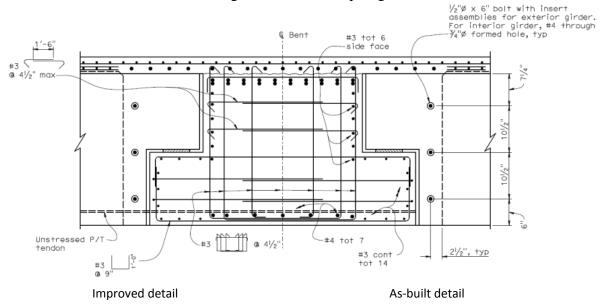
Girder-to-cap Connection Detail for the Test Unit (1 ft = 0.3048 m; 1 in. = 25.4 mm)
